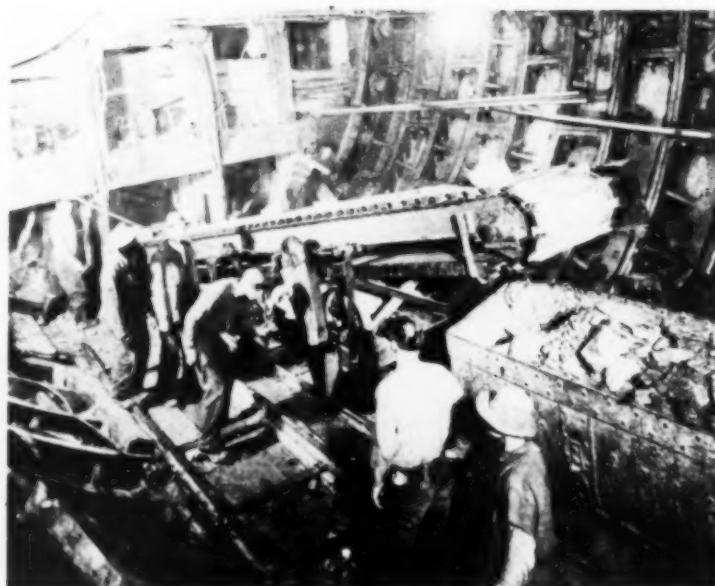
PORTABLE BELT CONVEYOR loads muck into "battleship" in shield tunnel passing through section of rock, Lincoln Tunnel, New York.
